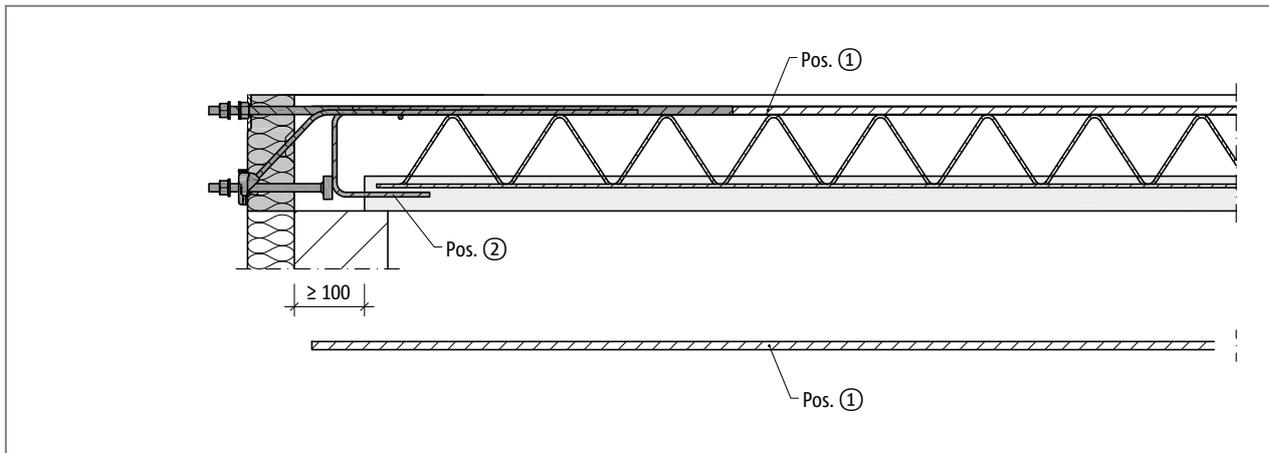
Schöck Isokorb® T type SK-M1: On-site reinforcement for semi-precast construction: Cross section
